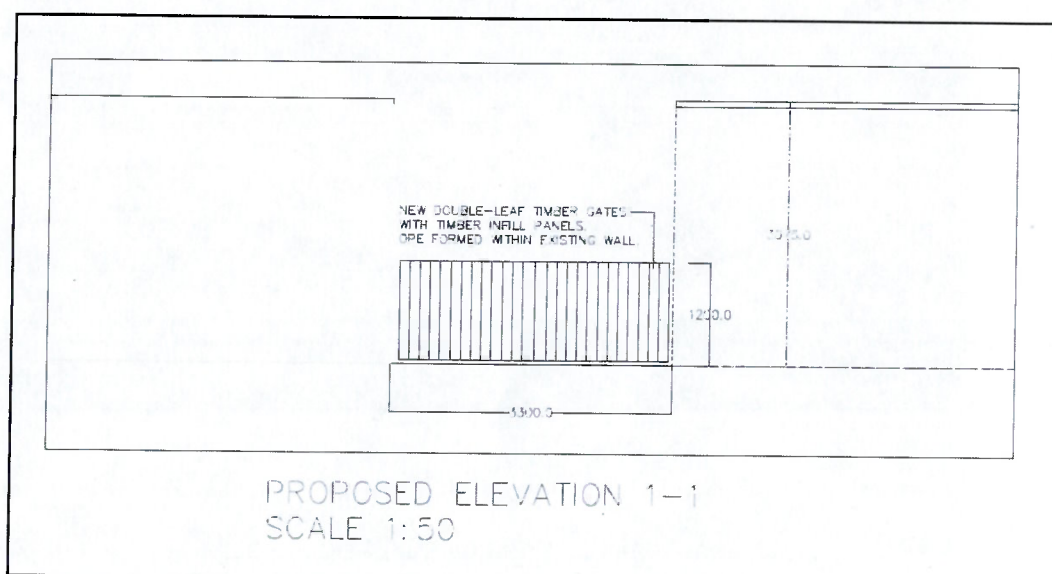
Proposed elevation of stone wall. (Source: Eugene Keyes c/o Bishop's House, Carlow).
